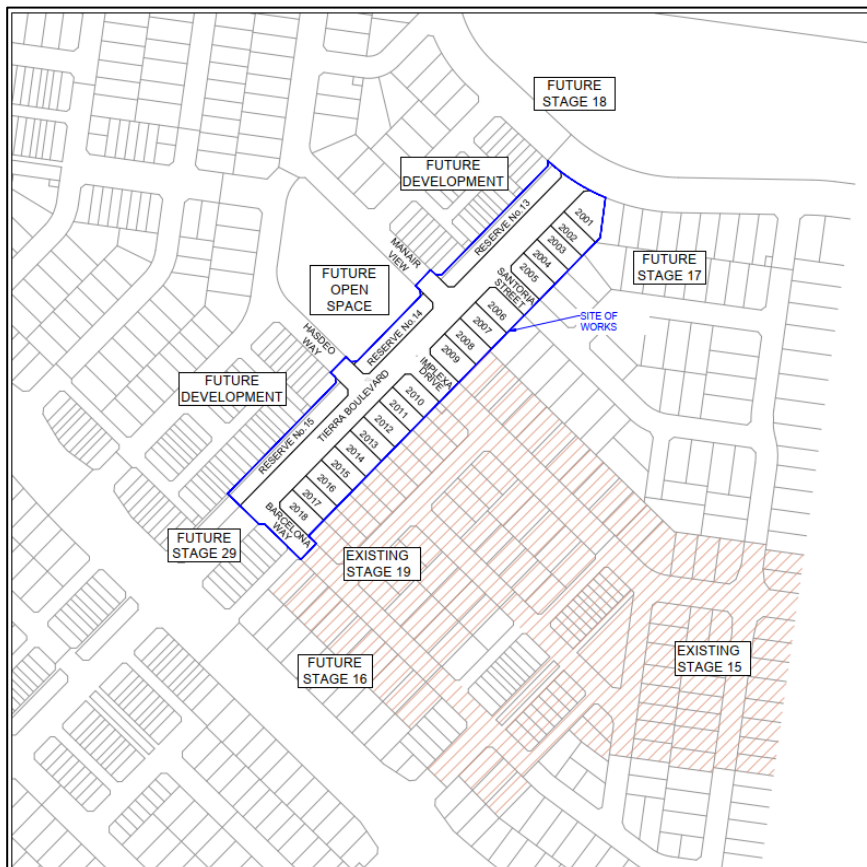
Locality Site Plan (Source: 200282.20 – Alamora Stage 20)
